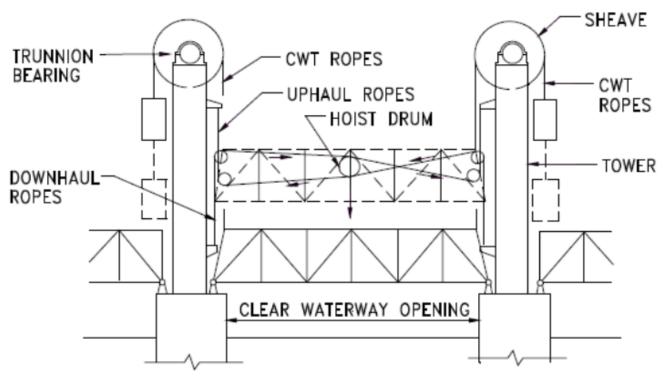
Span drive vertical lift bridge (Berger et al., 2015b)
